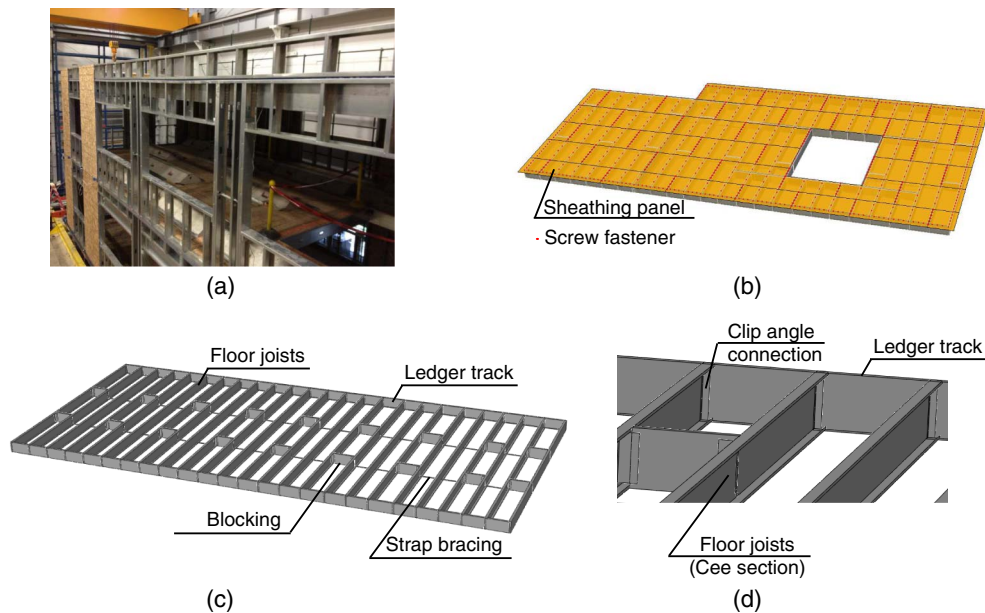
Cold-formed steel (CFS) framed building is a complex structural system of components and connections: (a) low-rise building showing gravity walls, shear walls, and floor diaphragm under construction (data from Peterman et al. 2016a, © ASCE); (b) typical floor diaphragm system with oriented-strand board (OSB) sheathing connected to steel joist top flanges and ledger tracks with self-drilling screw fasteners (openings used for stairways); (c) cold-formed steel floor framing system showing joists, ledger track, blocking, and strap bracing; (d) floor joist to ledger track connection detail (data from Madsen et al. 2011)
